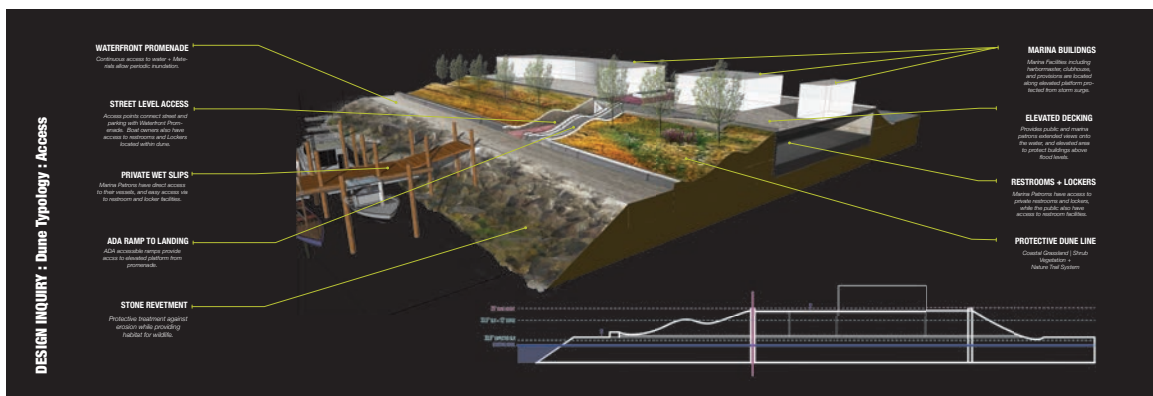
Duneline Typology 'Access' Detail (Wierengo)
